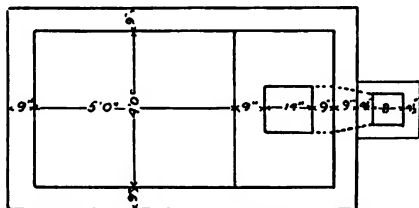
A TOP PLAN OF THE ARRANGEMENT IN FIG. 1
